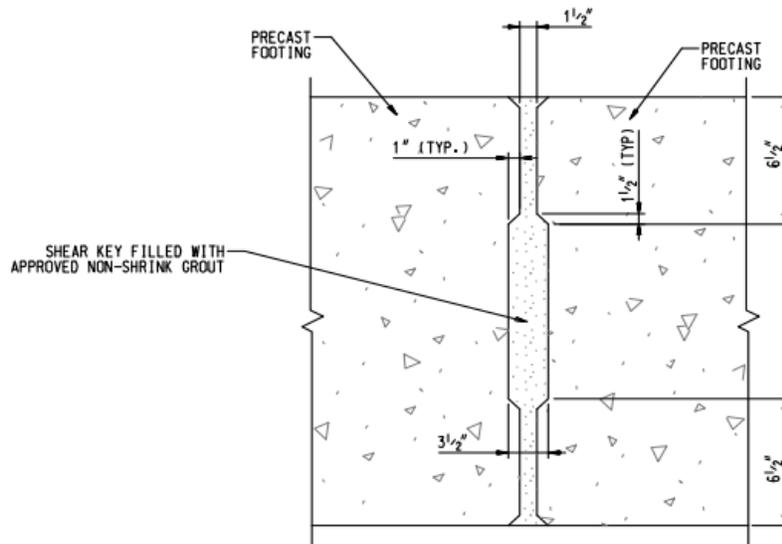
79 Precast concrete footing to precast concrete footing connection [8].
